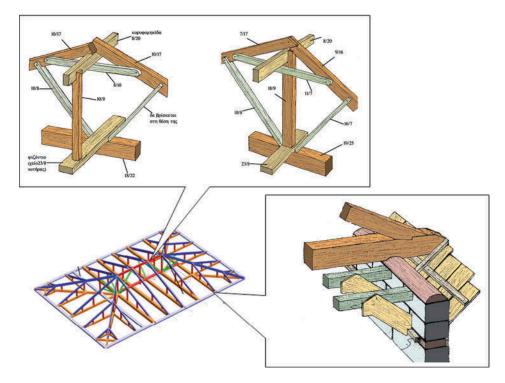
Hagi Mehmet Aga mosque (Rhodes, Greece). Examples of axonometric drawings: general lay-out of the structural system and construction details.
